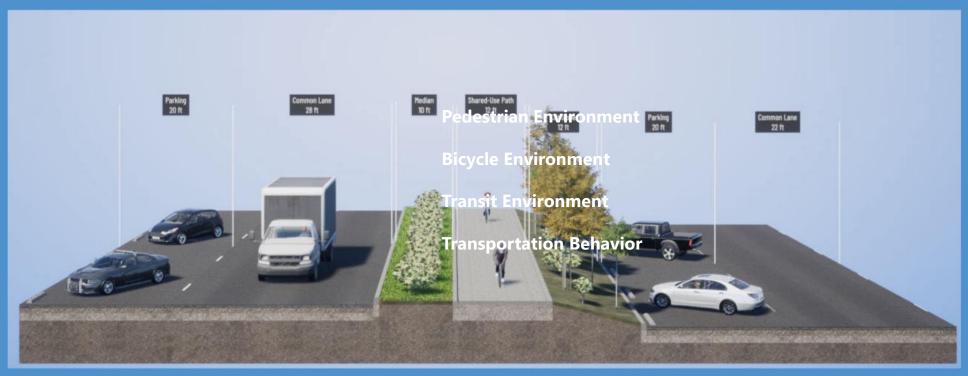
Meyers-Beavercreek Proposed Cross-Section (Through Retail)
